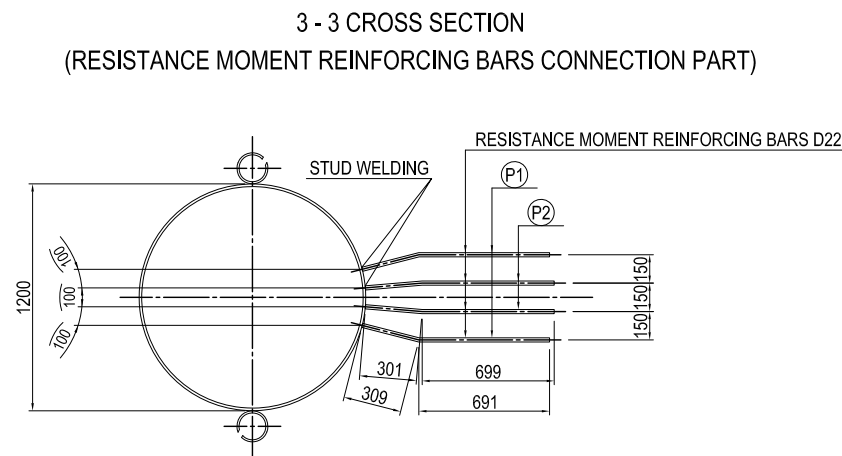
# DETAIL OF CONNECTION BETWEEN STEEL PIPE SHEET PILE AND FOOTING OF P14 PIER
